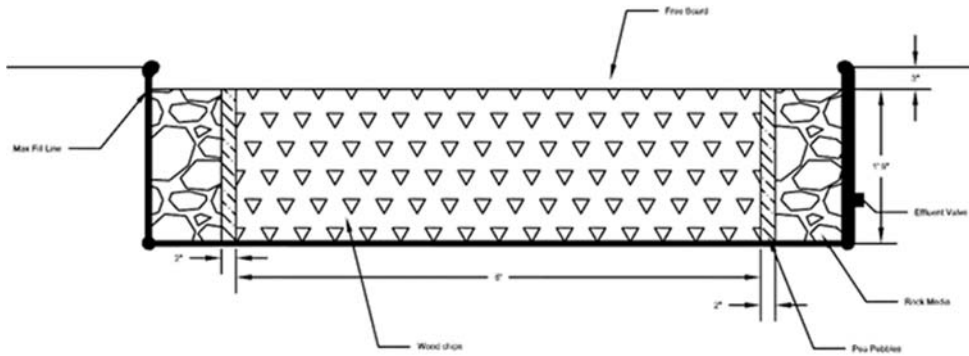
AutoCAD Drawing illustrating the basic layout of the system.
